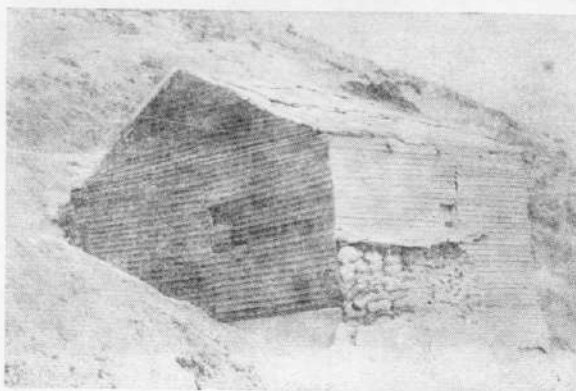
A timber frame house over a concrete water tank which suffered very less damage. Fall of plaster and fine cracks were seen in the walls of the tank.
